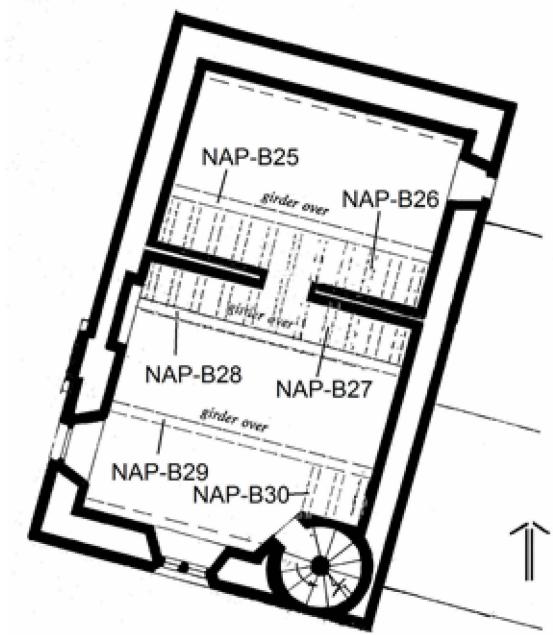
High-end tower, west tower, first-floor plan showing the location of samples NAP-B25–30 (John Warren)
